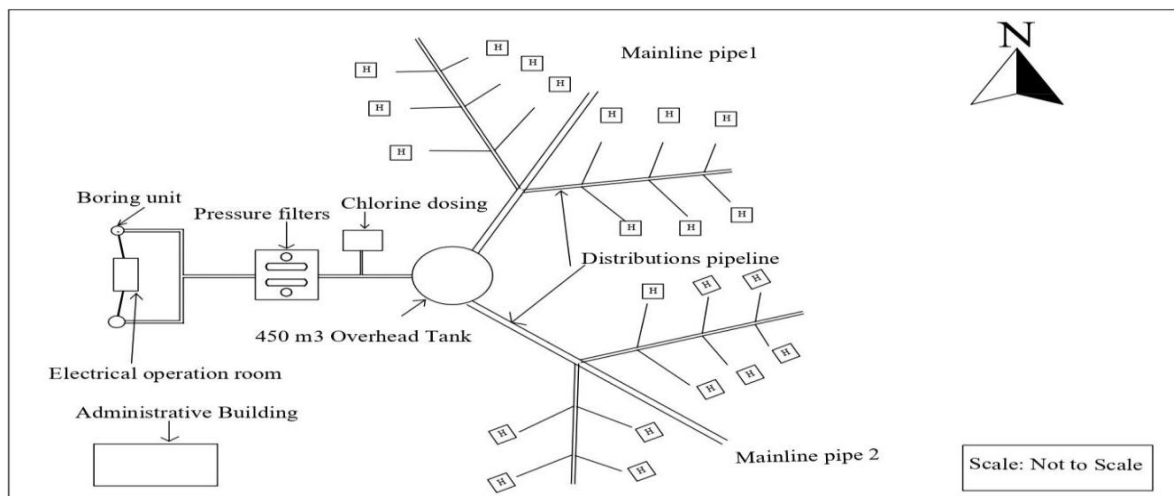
Lay out of dead end radial supply system for tank 1 and tank 3
